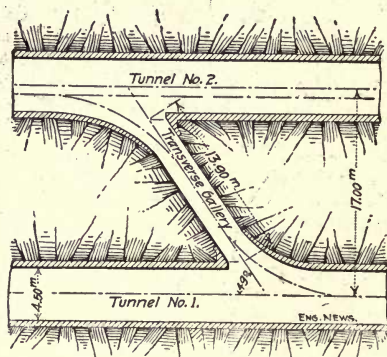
Plan of Portion of Twin Tunnels, Showing Cross-gallery.
